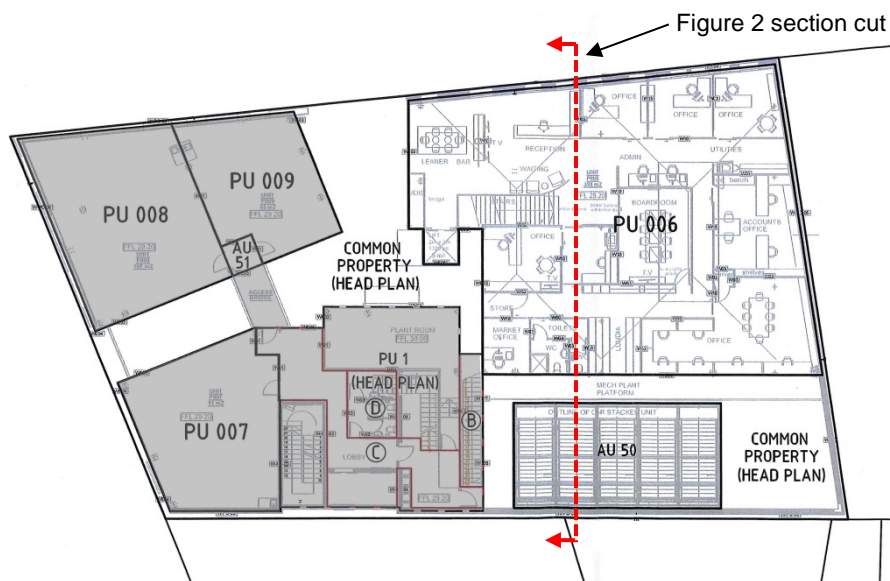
Level 1 plan with hotel building shown shaded (not to scale)
